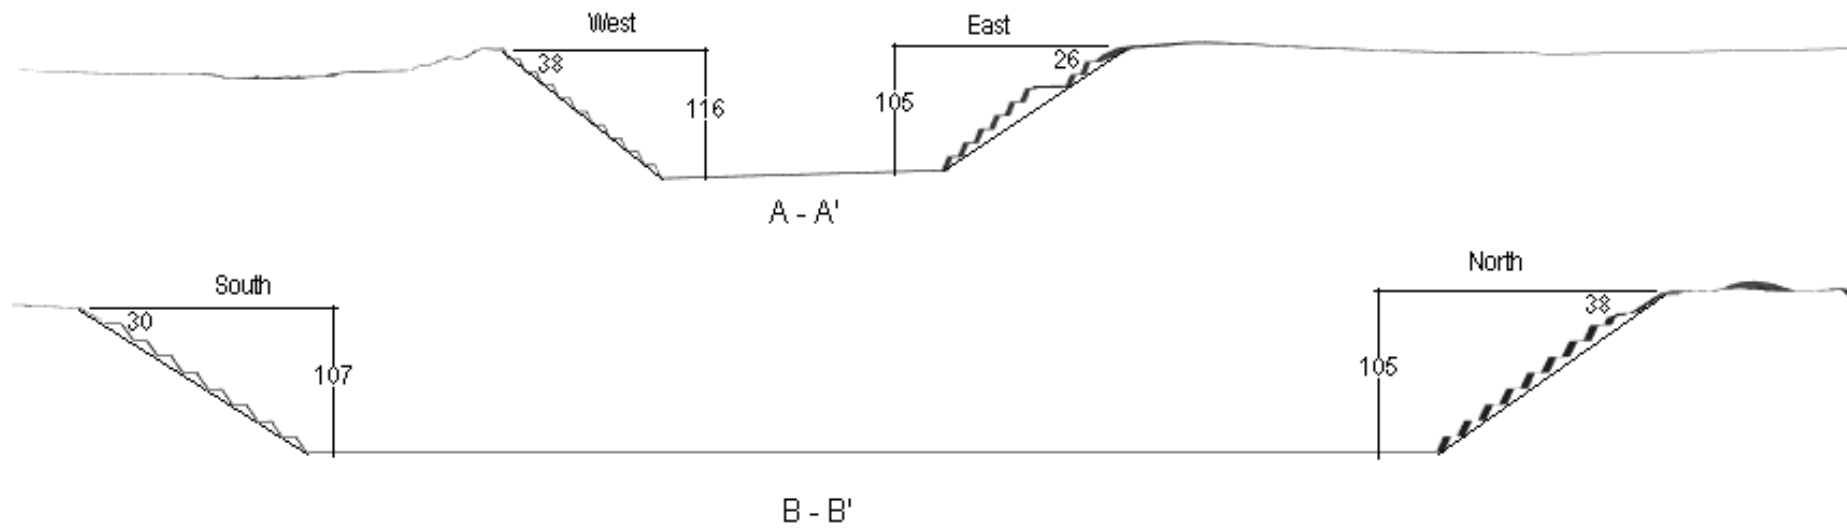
Cross-sections through the walls of Pit 3-4 at the EOML. Refer Figure 2 for locations. .
